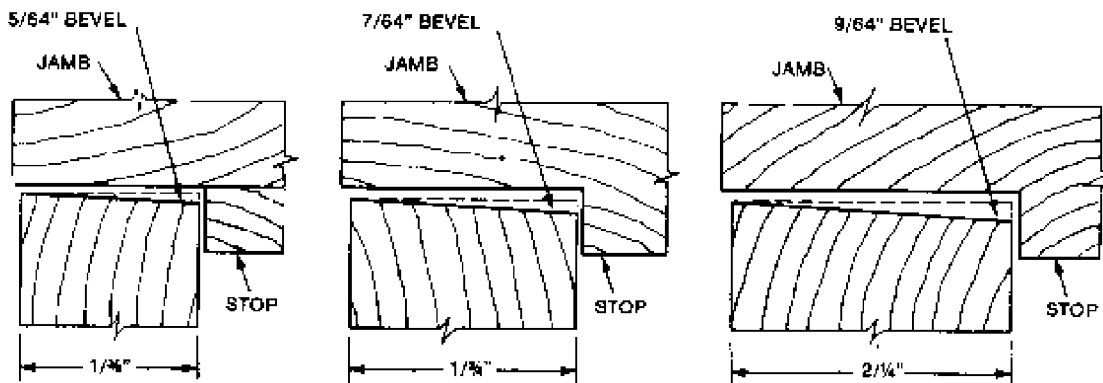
DOOR BEVEL FOR NORMAL WIDTH OPENINGS.
